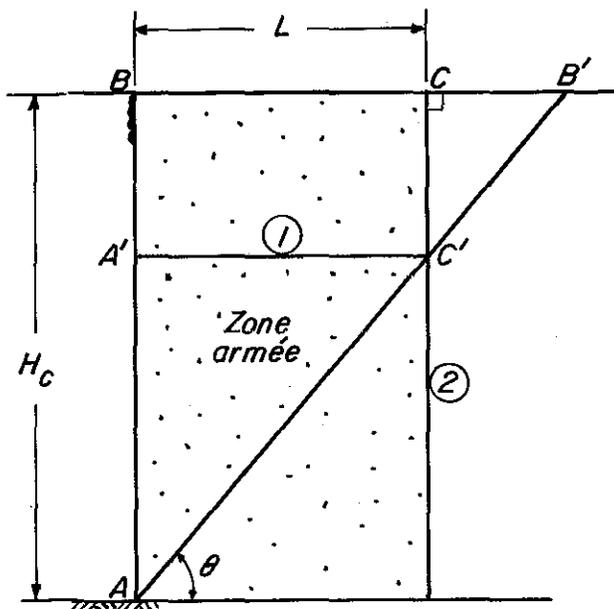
Trapezoidal failure zone for wall with short reinforcements (Bacot and Lareal)
